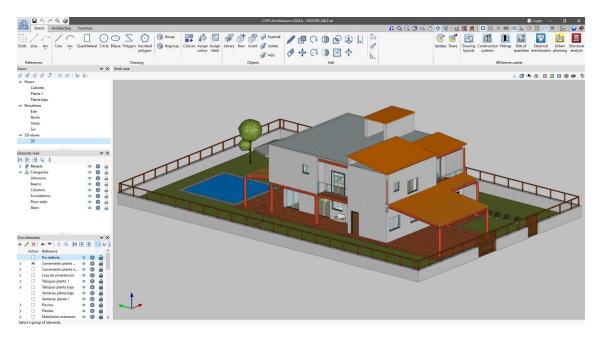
Architectural elements of the steel structure house in Cype Architecture
